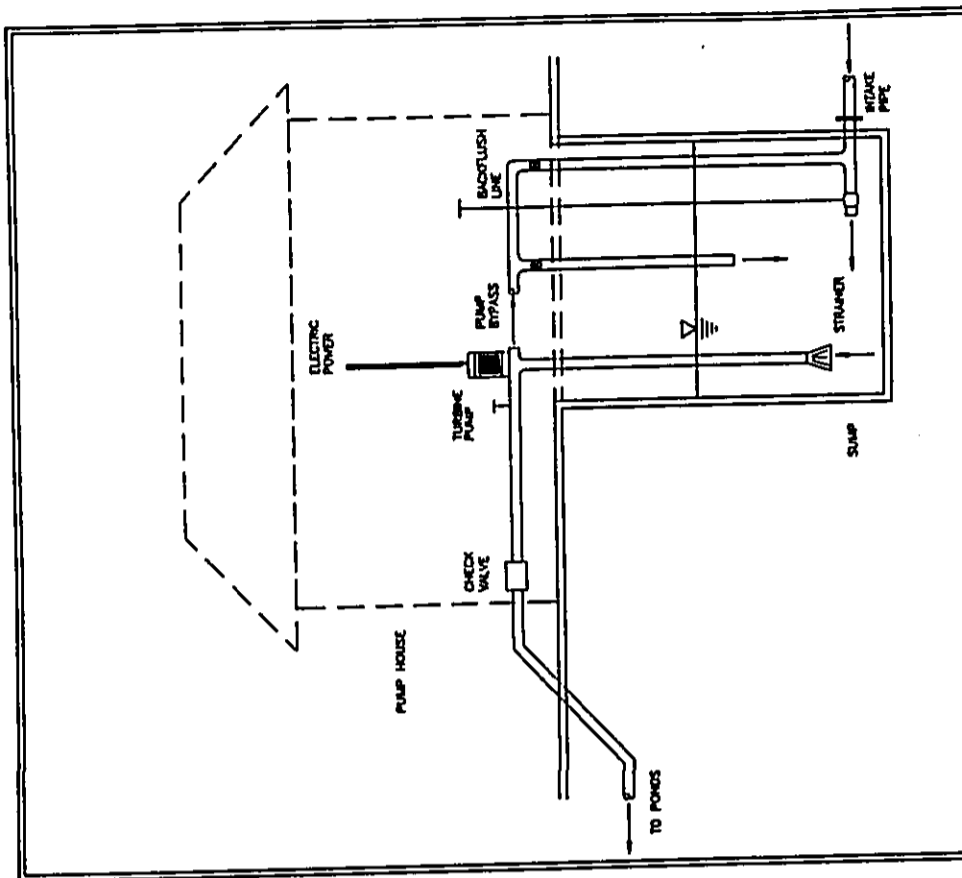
SUMP AND PUMP HOUSE CONCEPT
